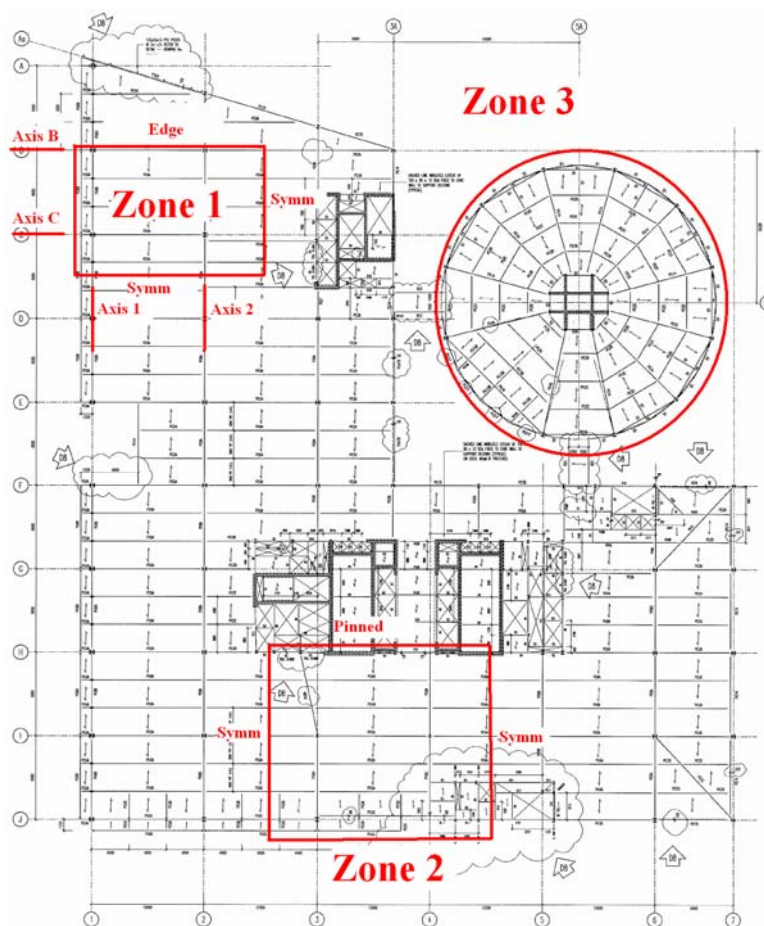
Third Floor Plan, models location and associated boundary conditions
